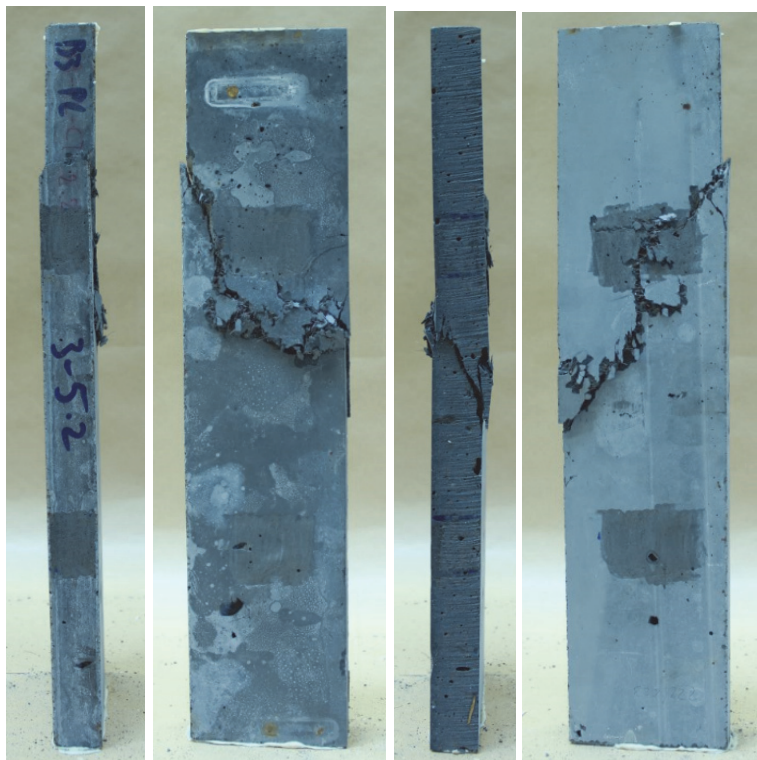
Specimen B3 5-2 (failure at 222'623 cycles)
